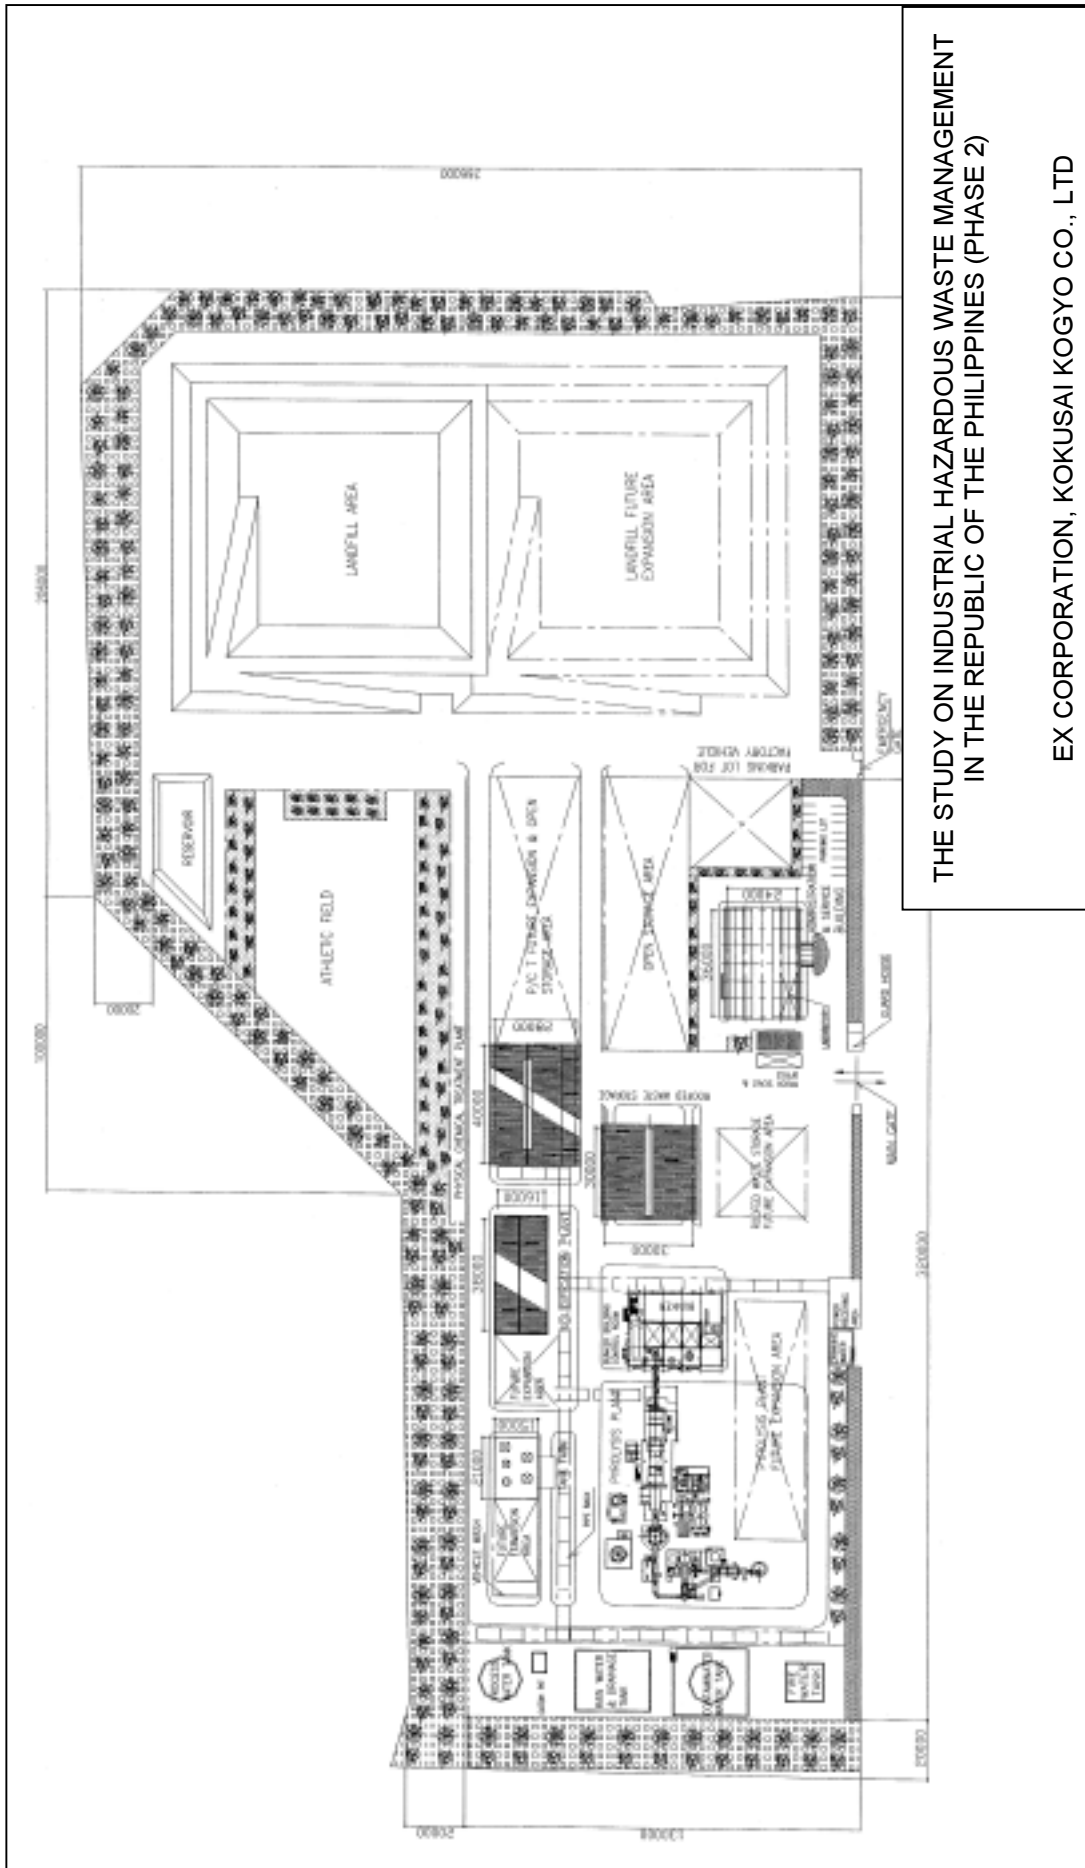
Layout Plan of the Industrial Hazardous Waste Treatment Facility
